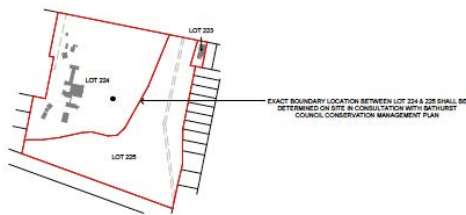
Concept plan of proposed works. (Marchese Partners/Life^{3A} 2024)
